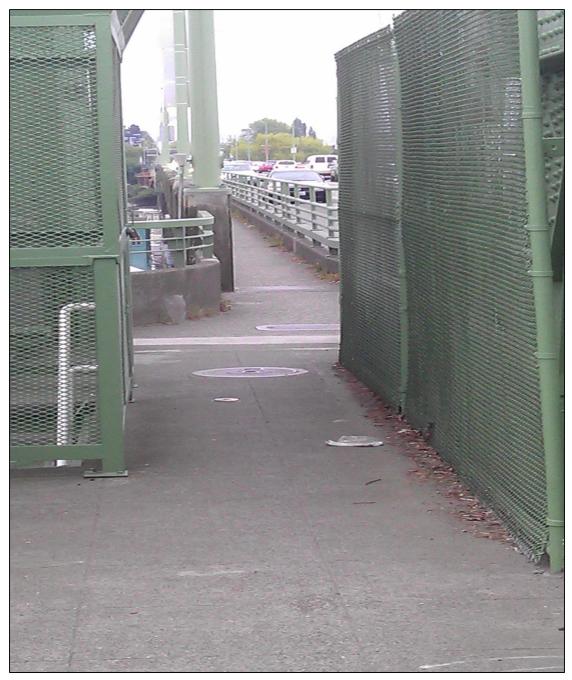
Existing conditions - narrowing sidewalks at corners of Ballard Bridge bascule
